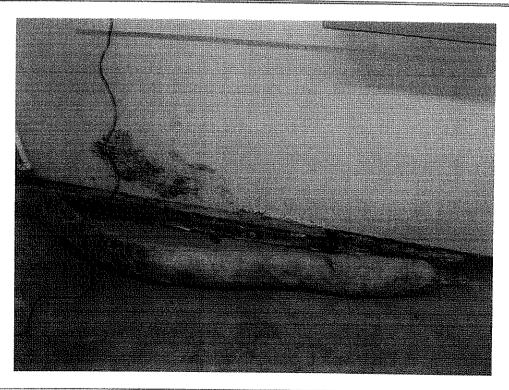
View of wall separating the mechanical room and the EOC. Note: Visible fungal growth on gypsum wallboard.
